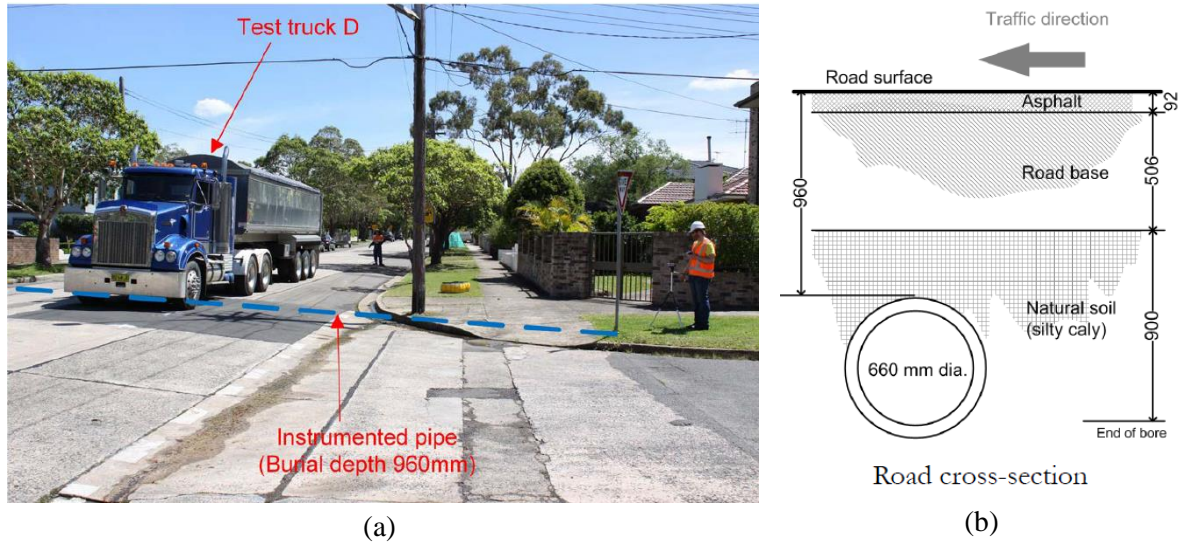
5 (a) Layout of truck tests; (b) Road cross-section of trunk tests (Chan et al., 2016b)
